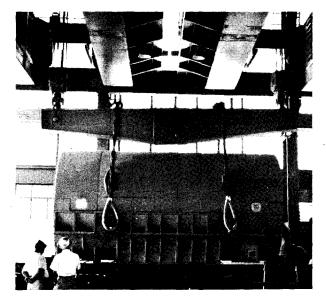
Unloading unit 1 stator, 198.8 tons, using both overhead cranes with lifting beam.
